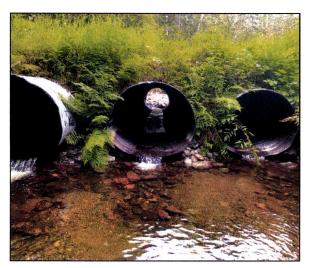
Outlets of the triple culvert bank waypoint 436.
